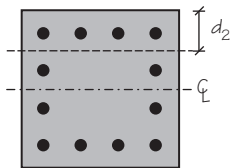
Depth, d_2 , to centroid of reinforcement in half section
